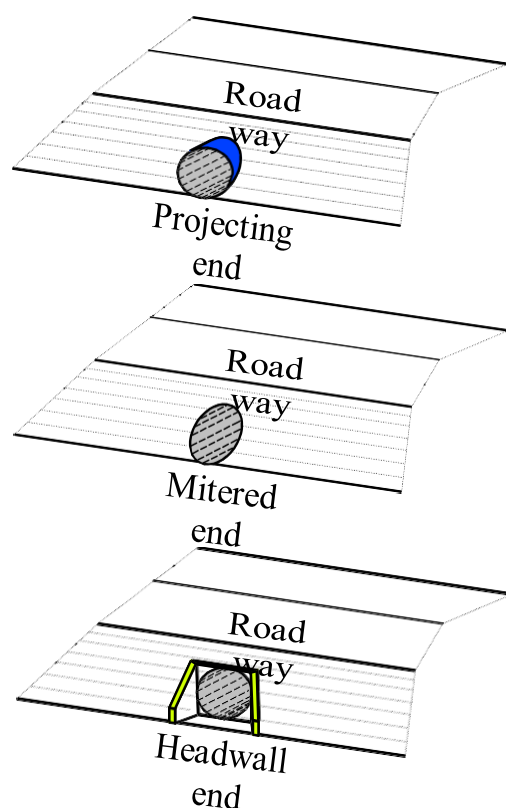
Inlet (outlet) designs (projecting, mitered, and headwall)
